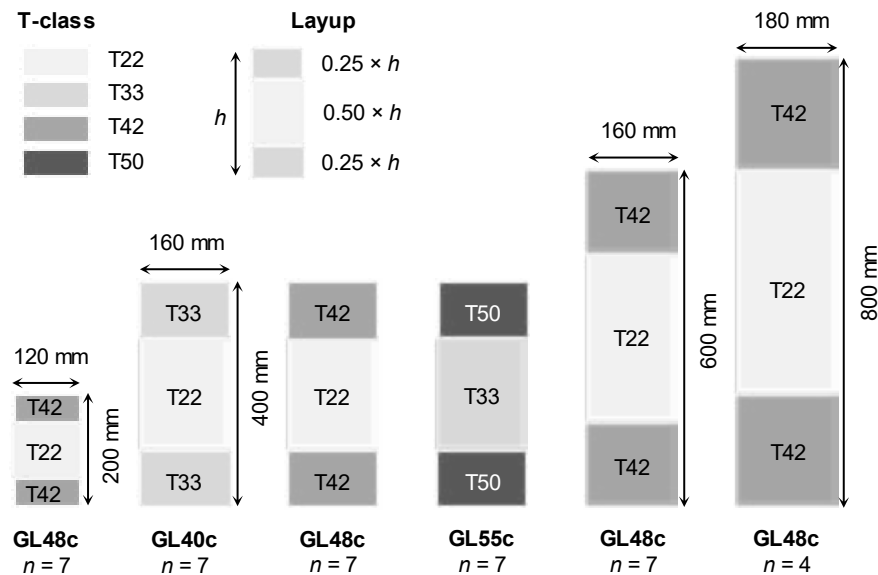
Cross-section layouts, dimensions and number of the specimens investigated in four-point bending tests.
